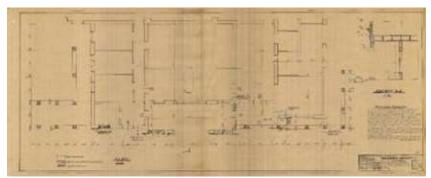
Partial plan of the building. (source: National Construction Archive)
